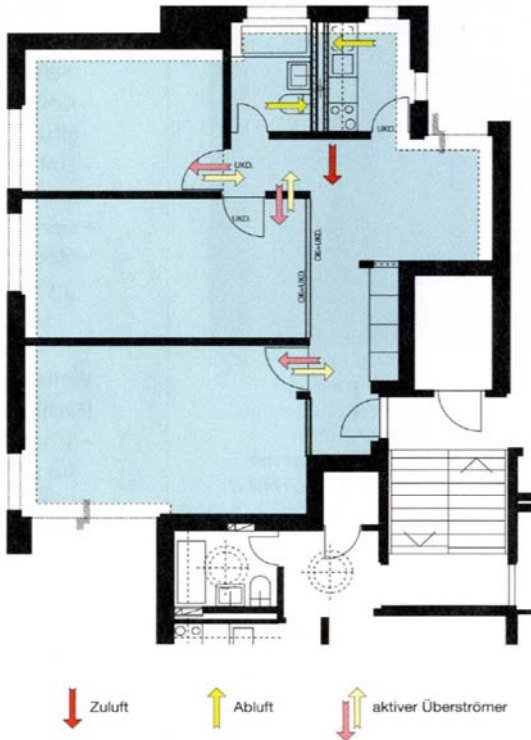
Floor plan of the apartment (PH Lodenaareal, Innsbruck) under investigation
